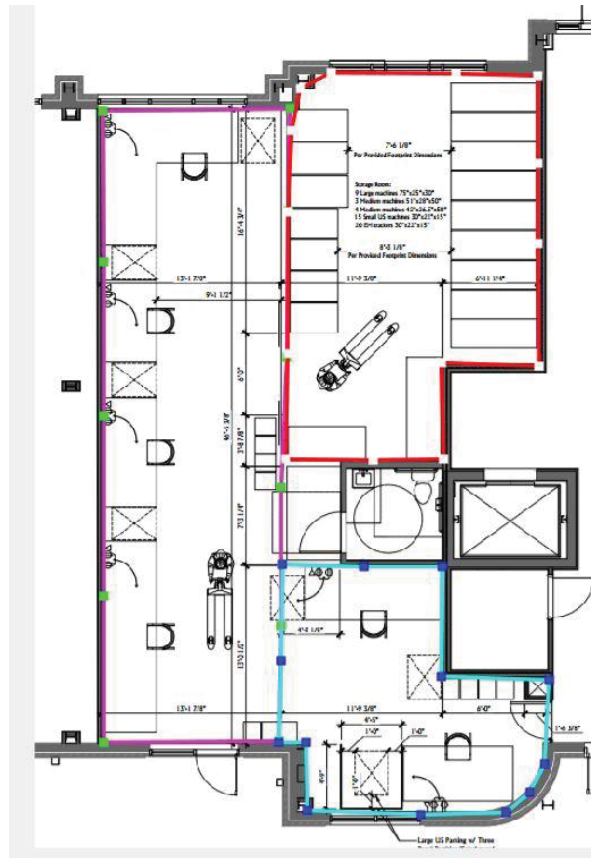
Zone and anchor placements for the floor layout simulation. Each of the 3 zones are outlined with their corresponding anchors marked in a separate color to each other zone's anchors
